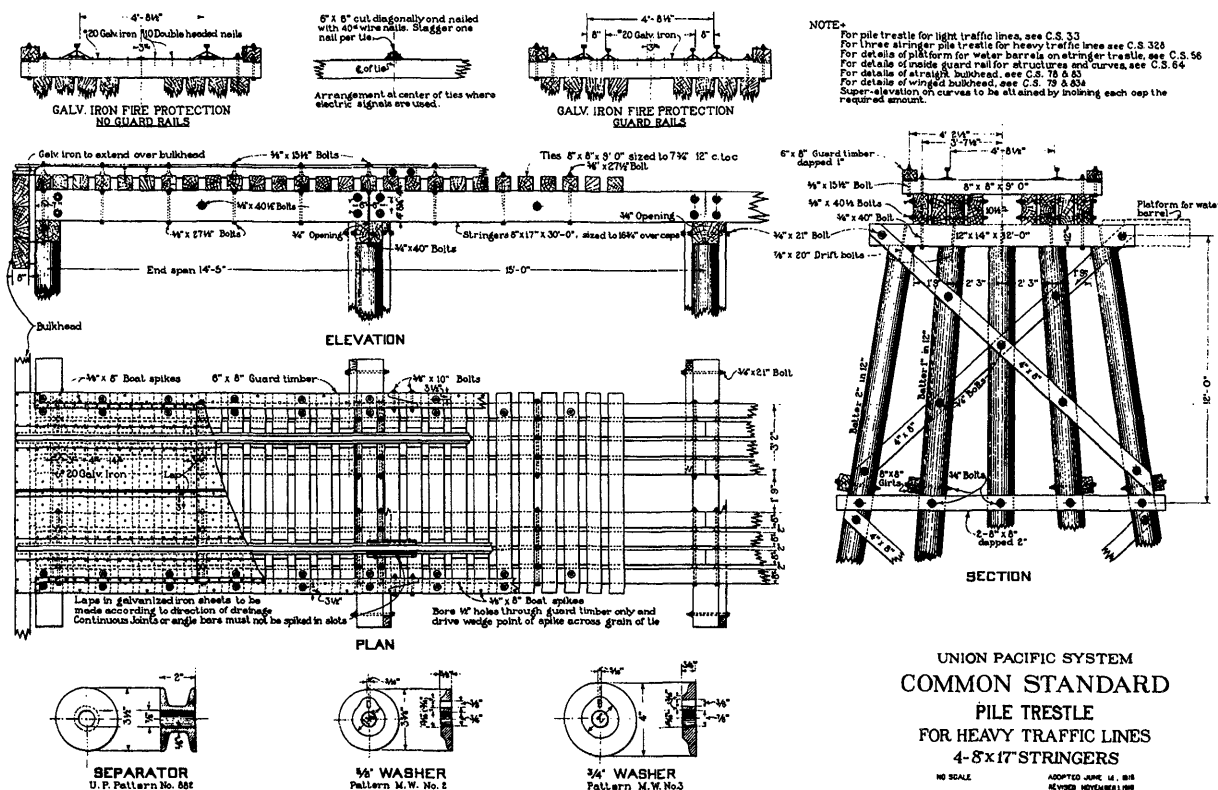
Timber pile trestle bridge, from Union Pacific standards
